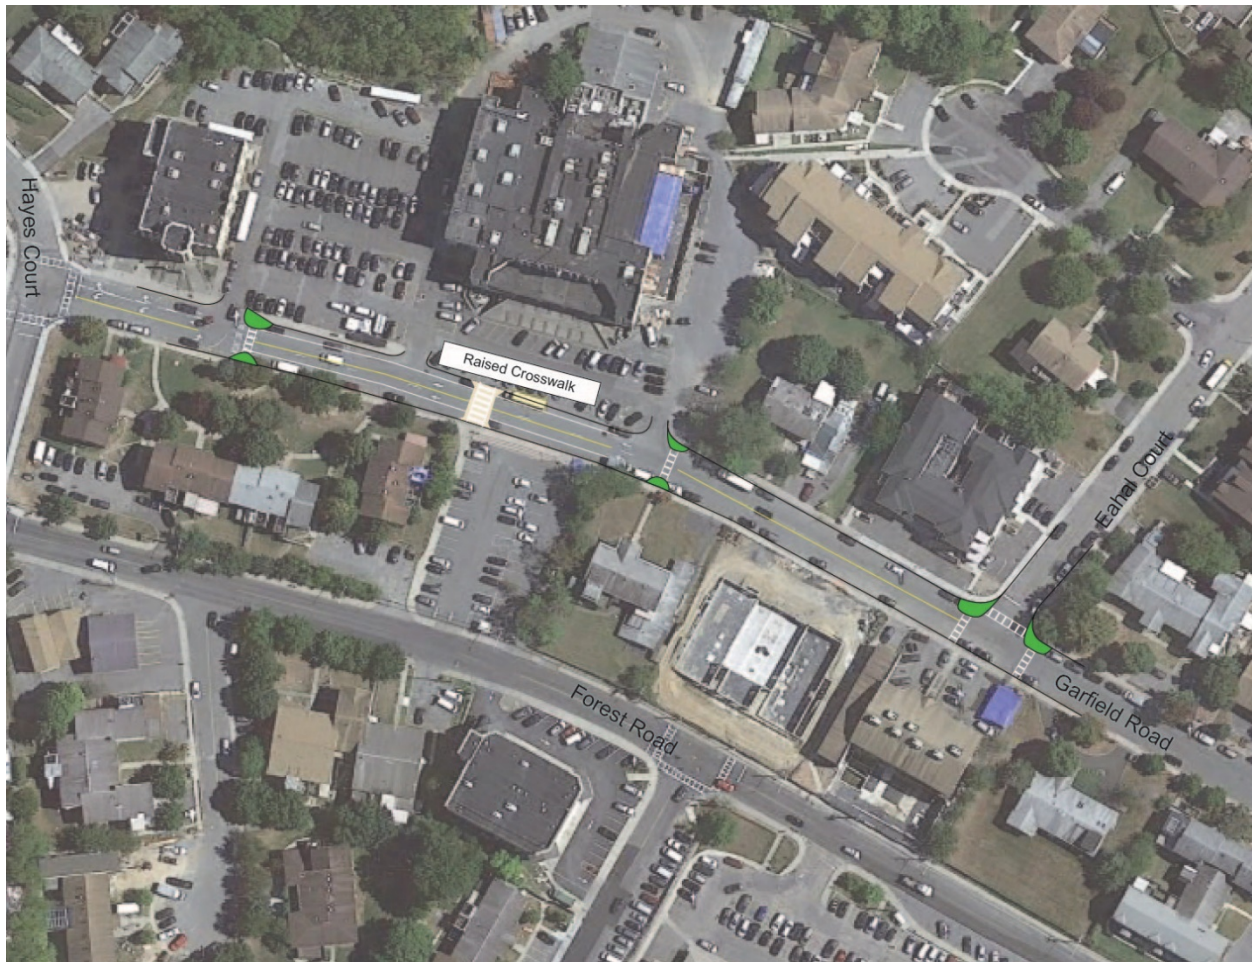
Garfield Road: Two-way with Raised Crosswalk
